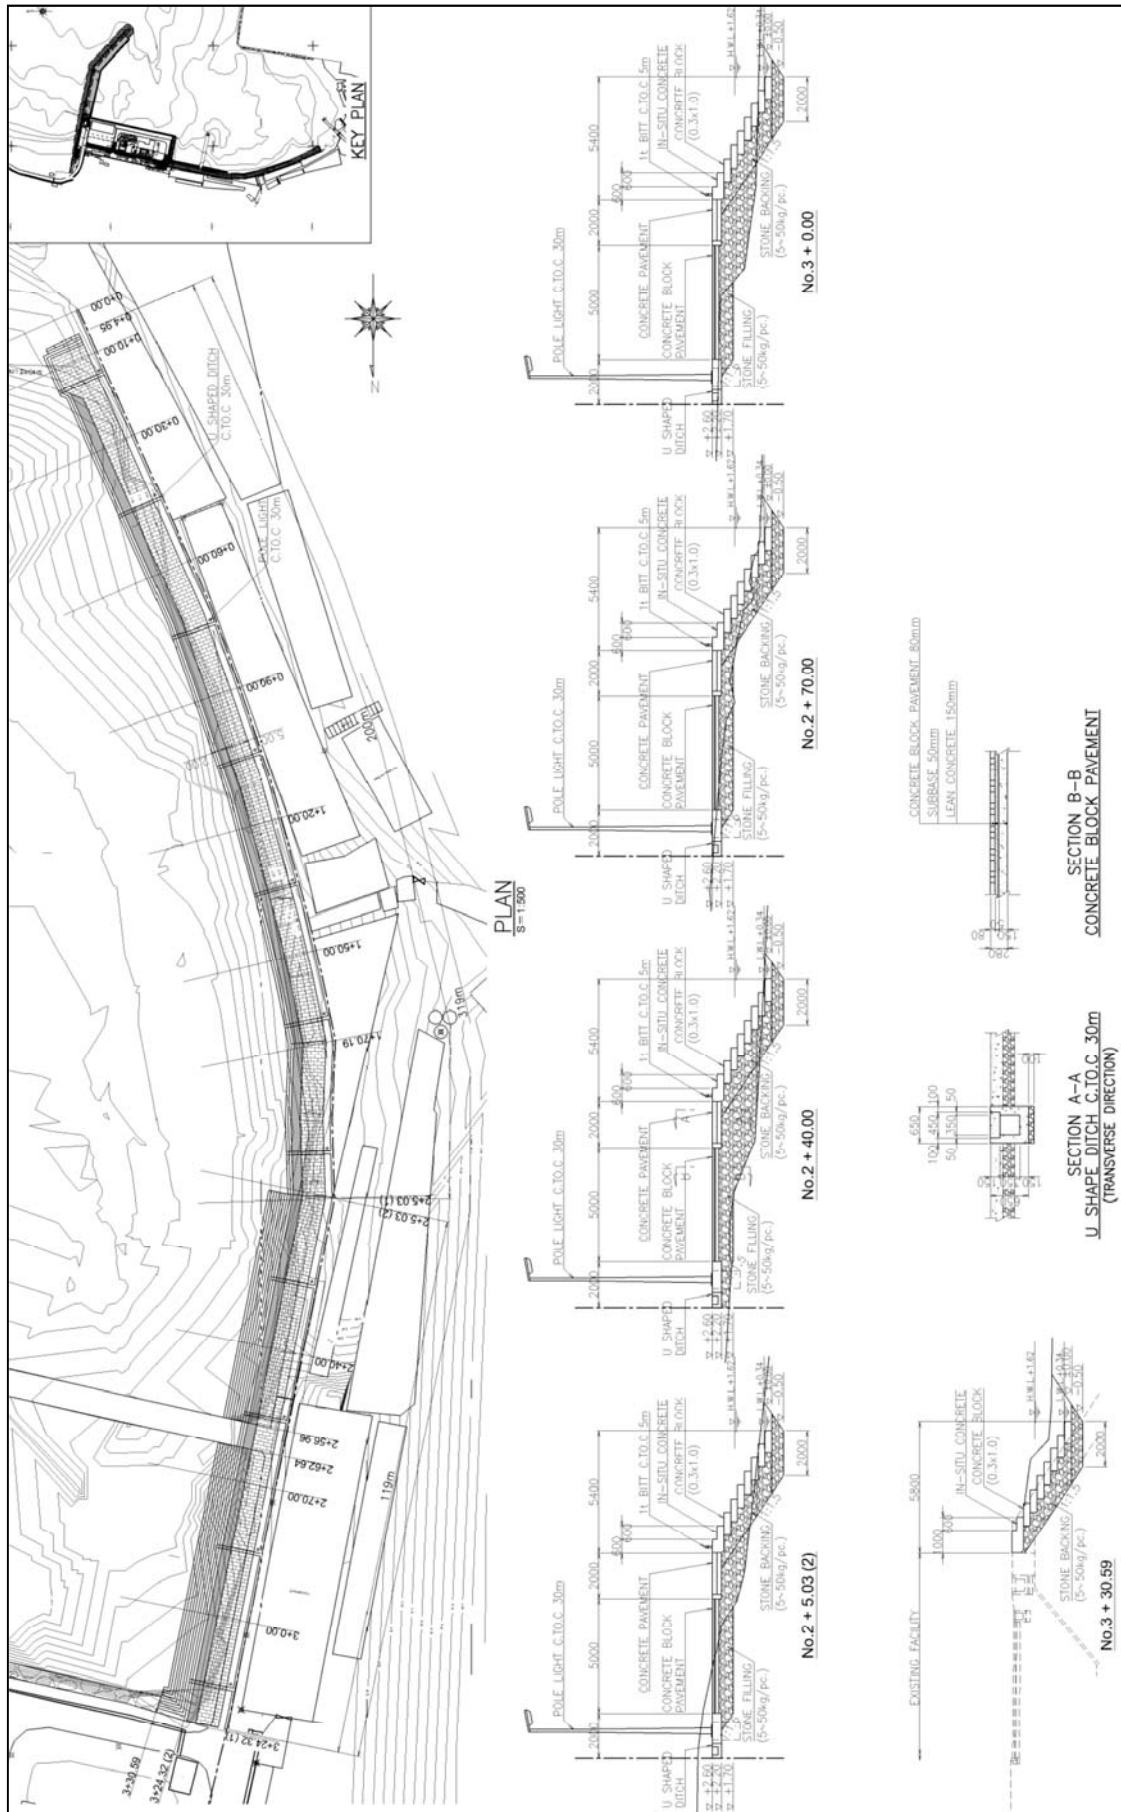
(4) Typical Cross Section of Access Driveway (1)
